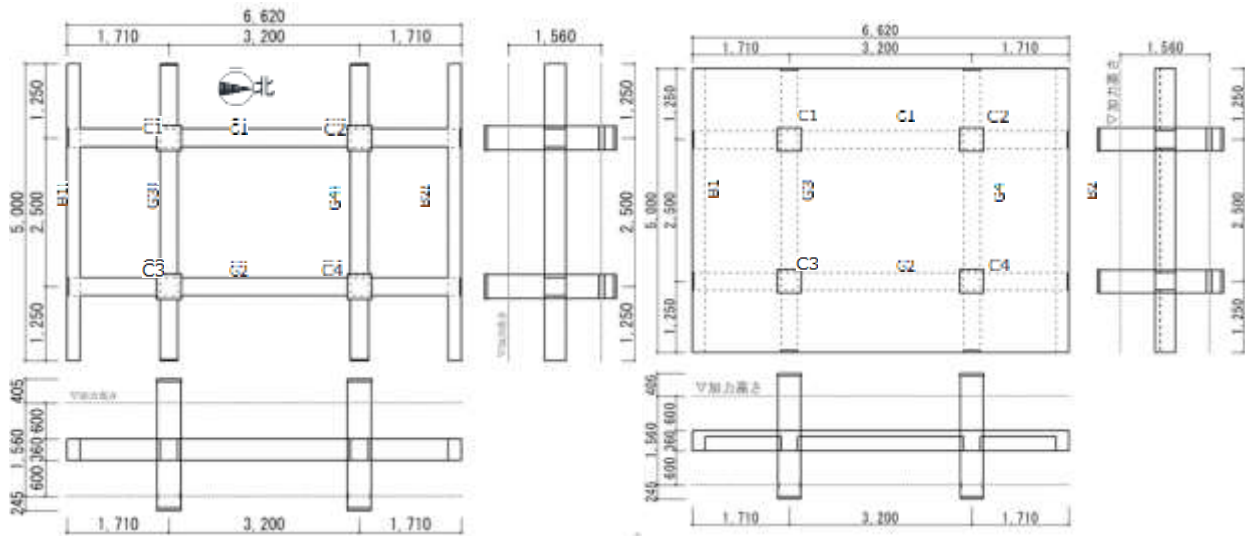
New loading method and slab assembly specimen representing moment-resisting frame to expected mechanism
